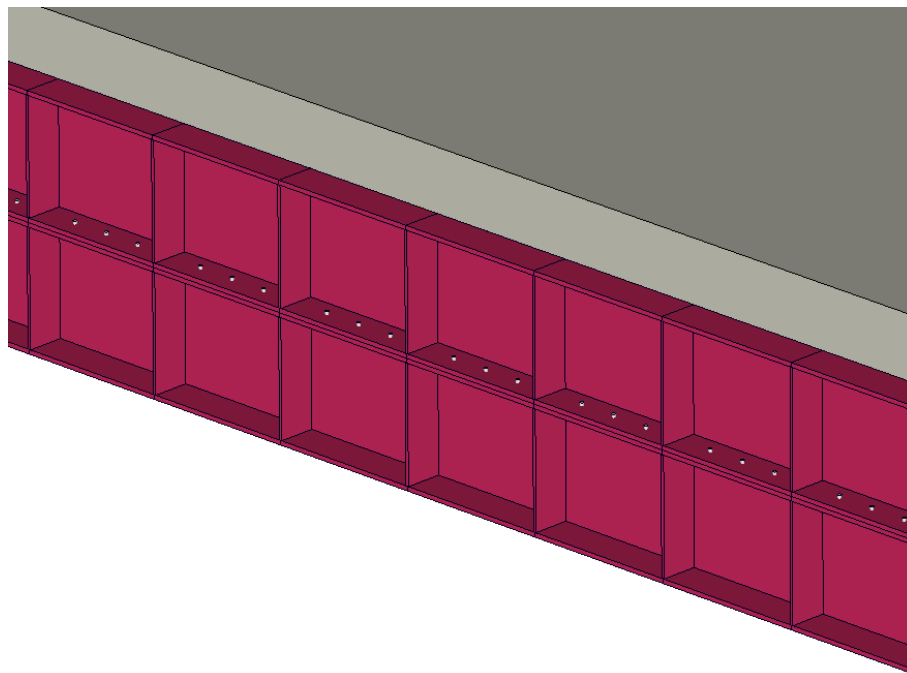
Coupling of two steel beams into unique cross-section – 2D FEs
